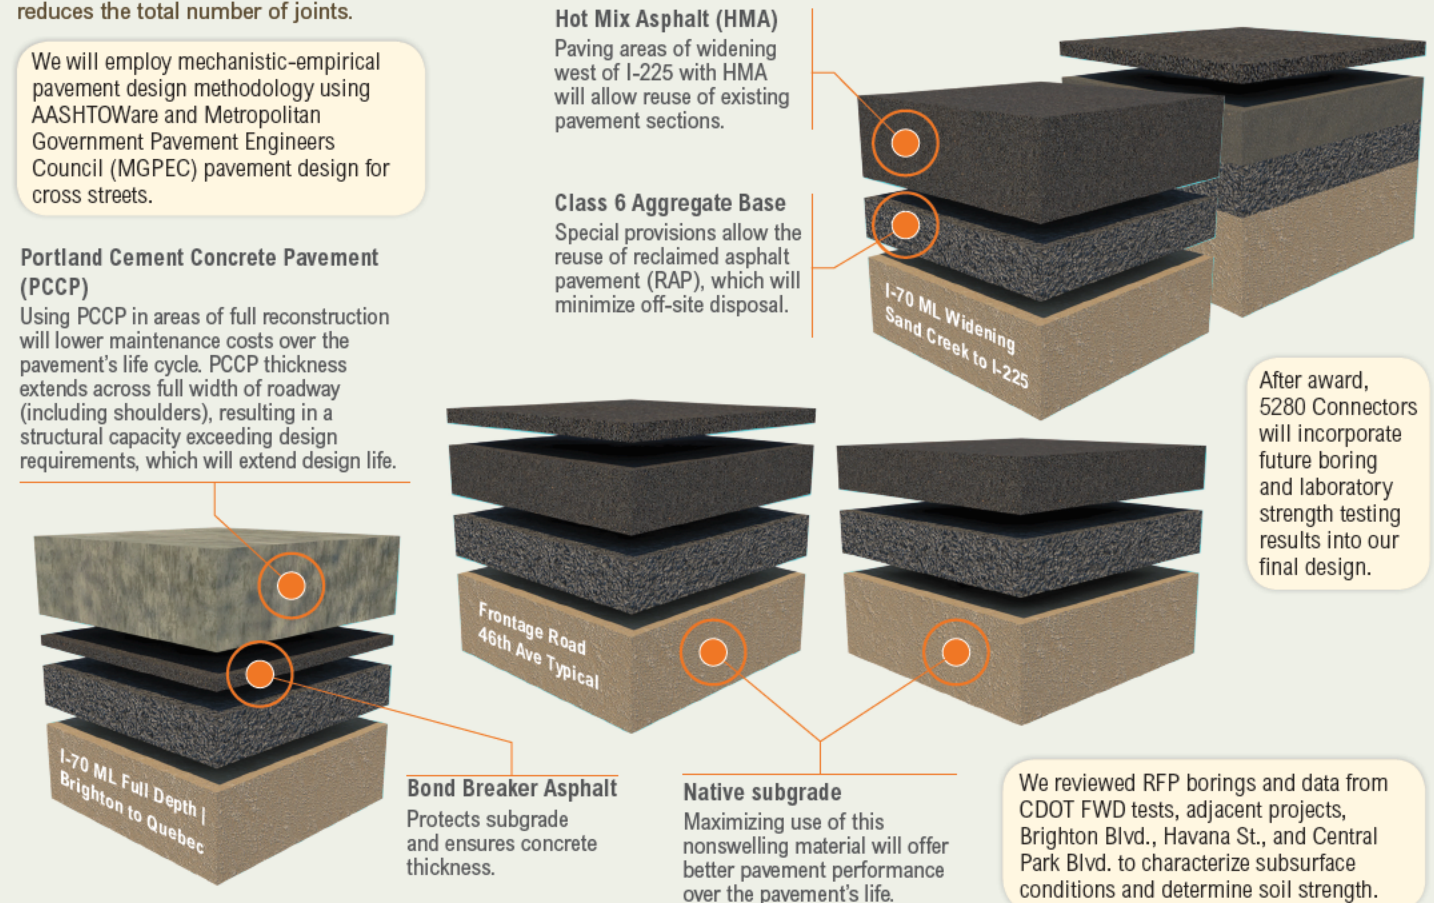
| Pavement Design Methodology: Per Table 6-1, Schedule 10, Section 6.3, 5280 Connectors' pavement design will adhere to the current CDOT Pavement Design Manual (2016) for interstate, frontage road, and ramp construction.
